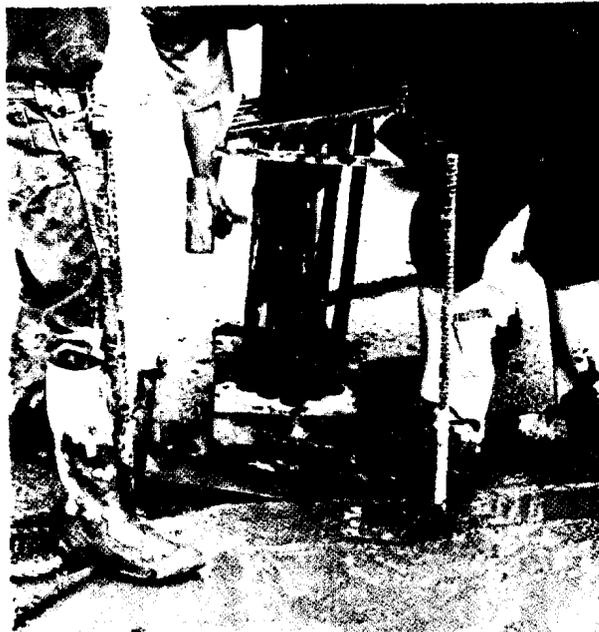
Placing wedge anchor plate, Interstate Highway I-96 retaining wall, Detroit
